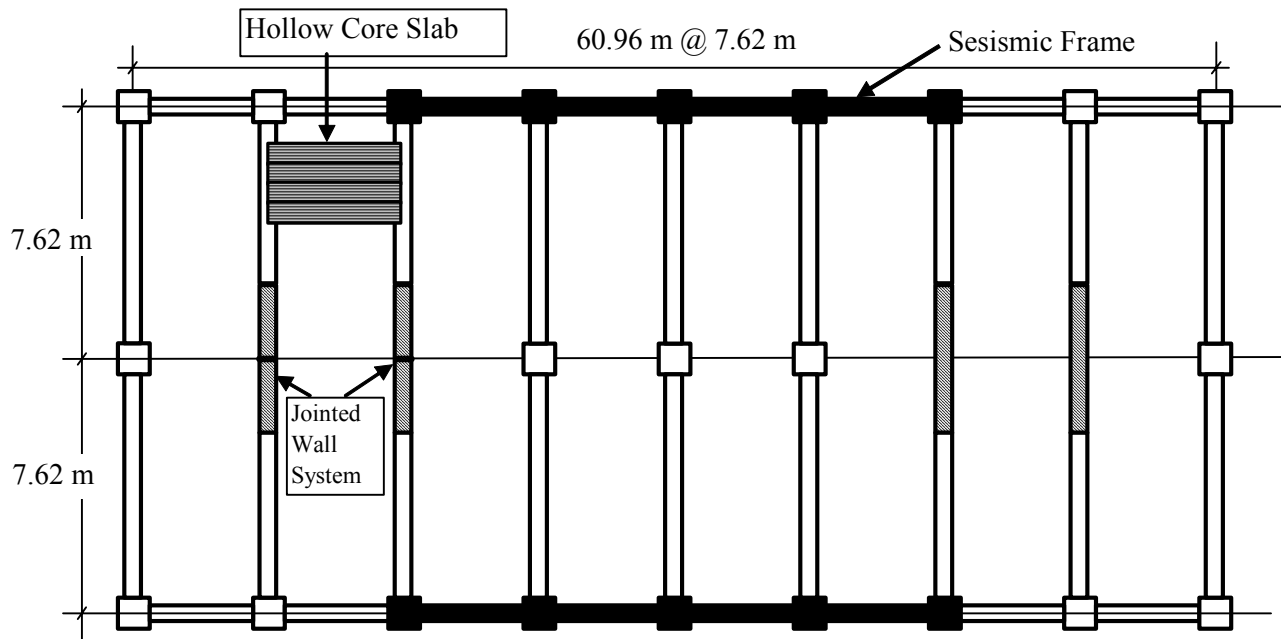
(b). Plan view of the five, seven and ten story prototype buildings
